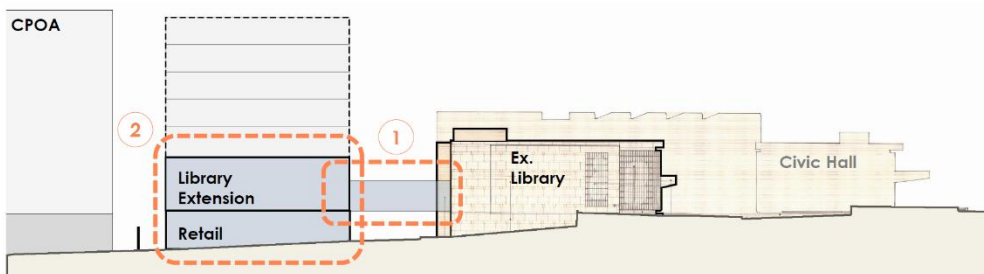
Section illustrating the concept of the proposed extension (Source: ACG Architects, 2026)
